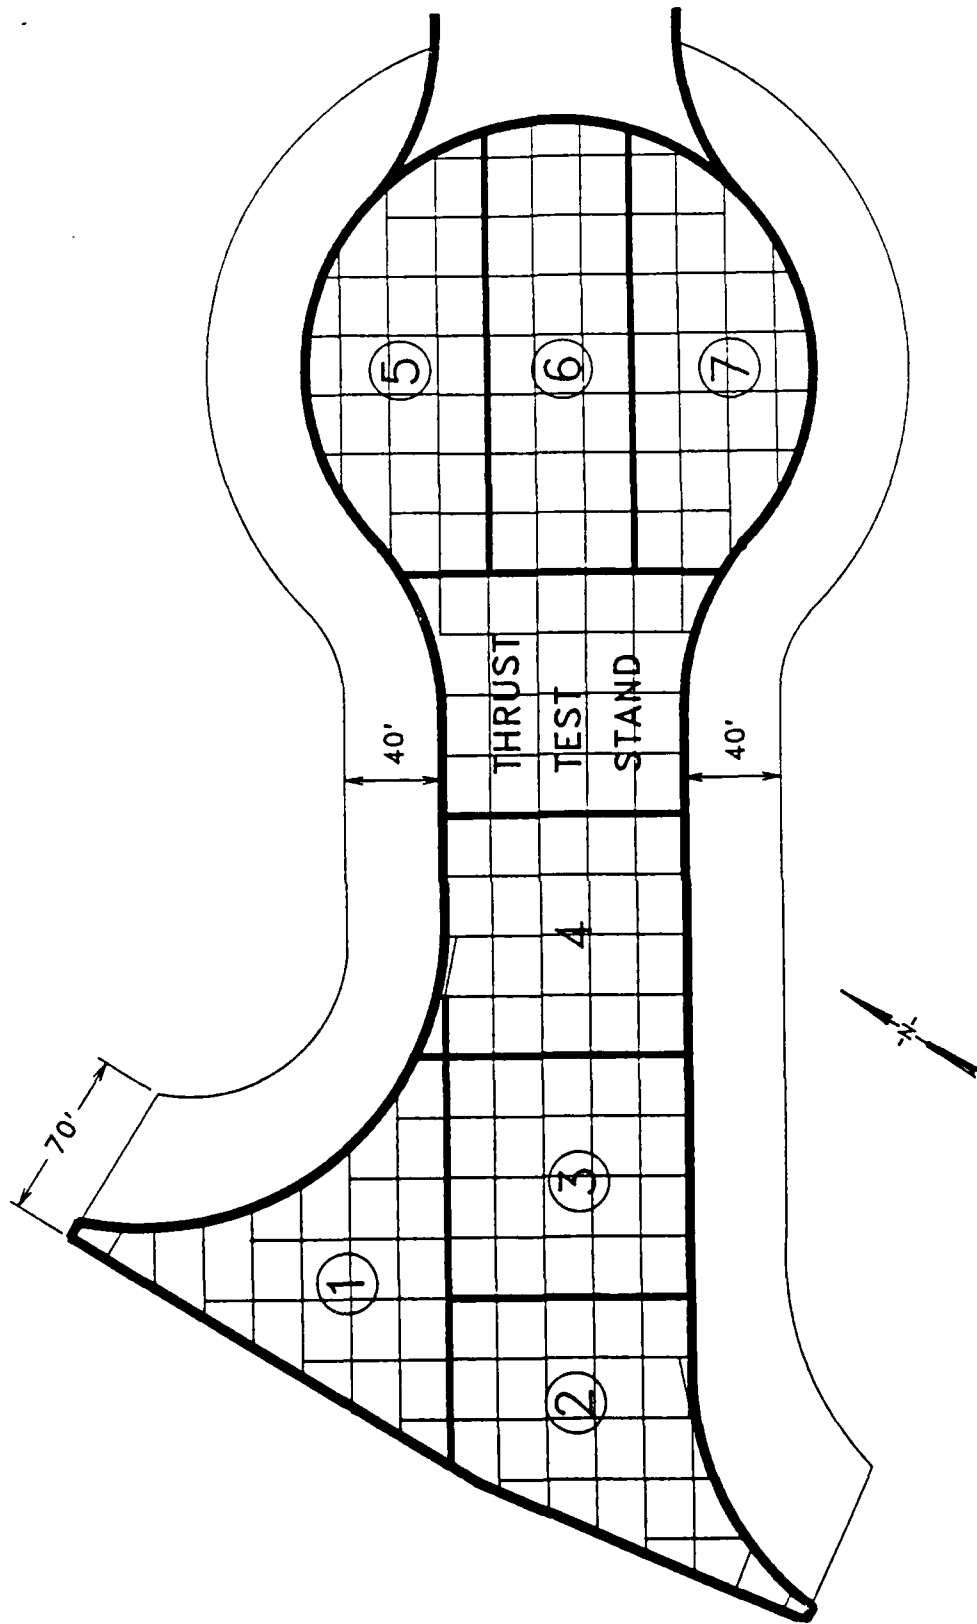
Sample unit layout, Pad 18 thrust stand (feature A28B)
